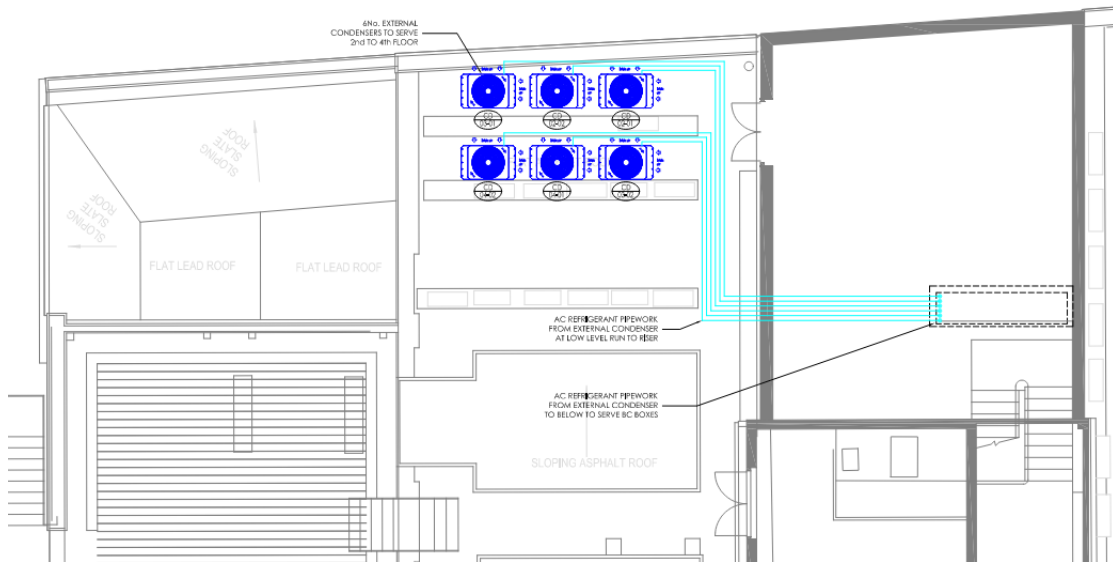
Screenshot of drawing showing proposed rooftop plant layout
